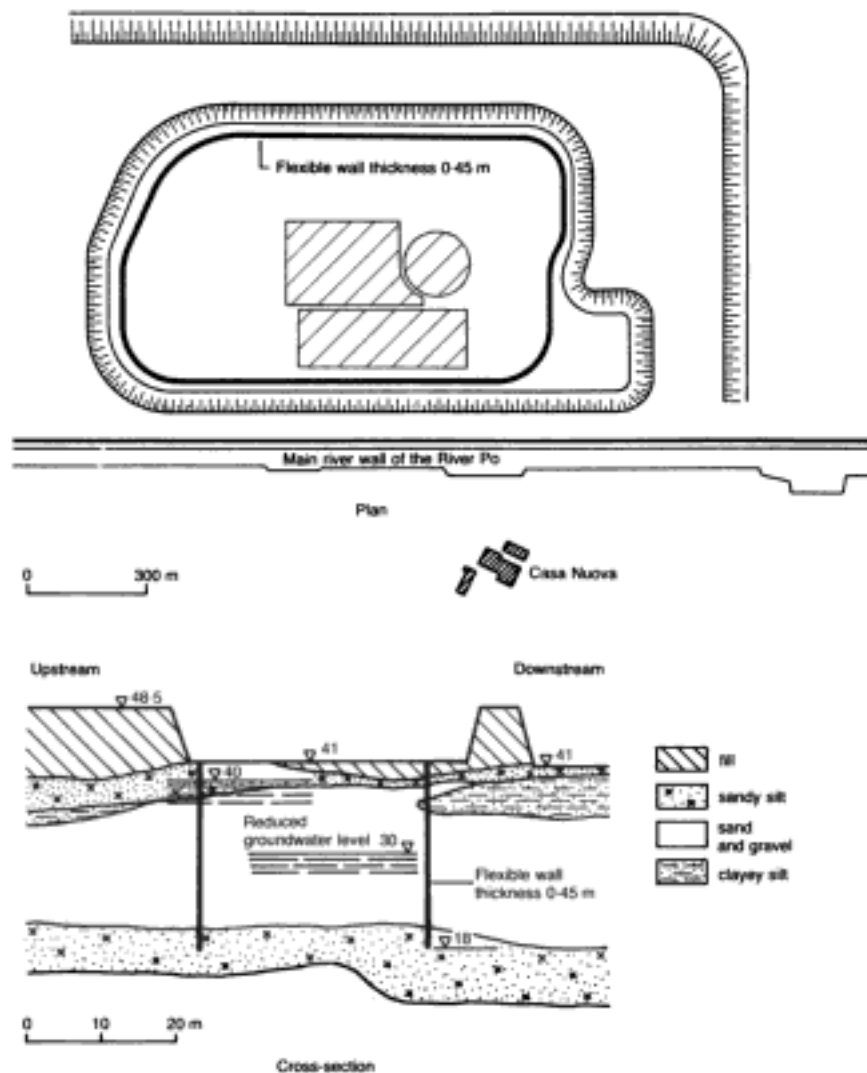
Plan and cross-section of cut-off construction for deep excavation at Caorso, Italy (Tornaghi¹⁵)
